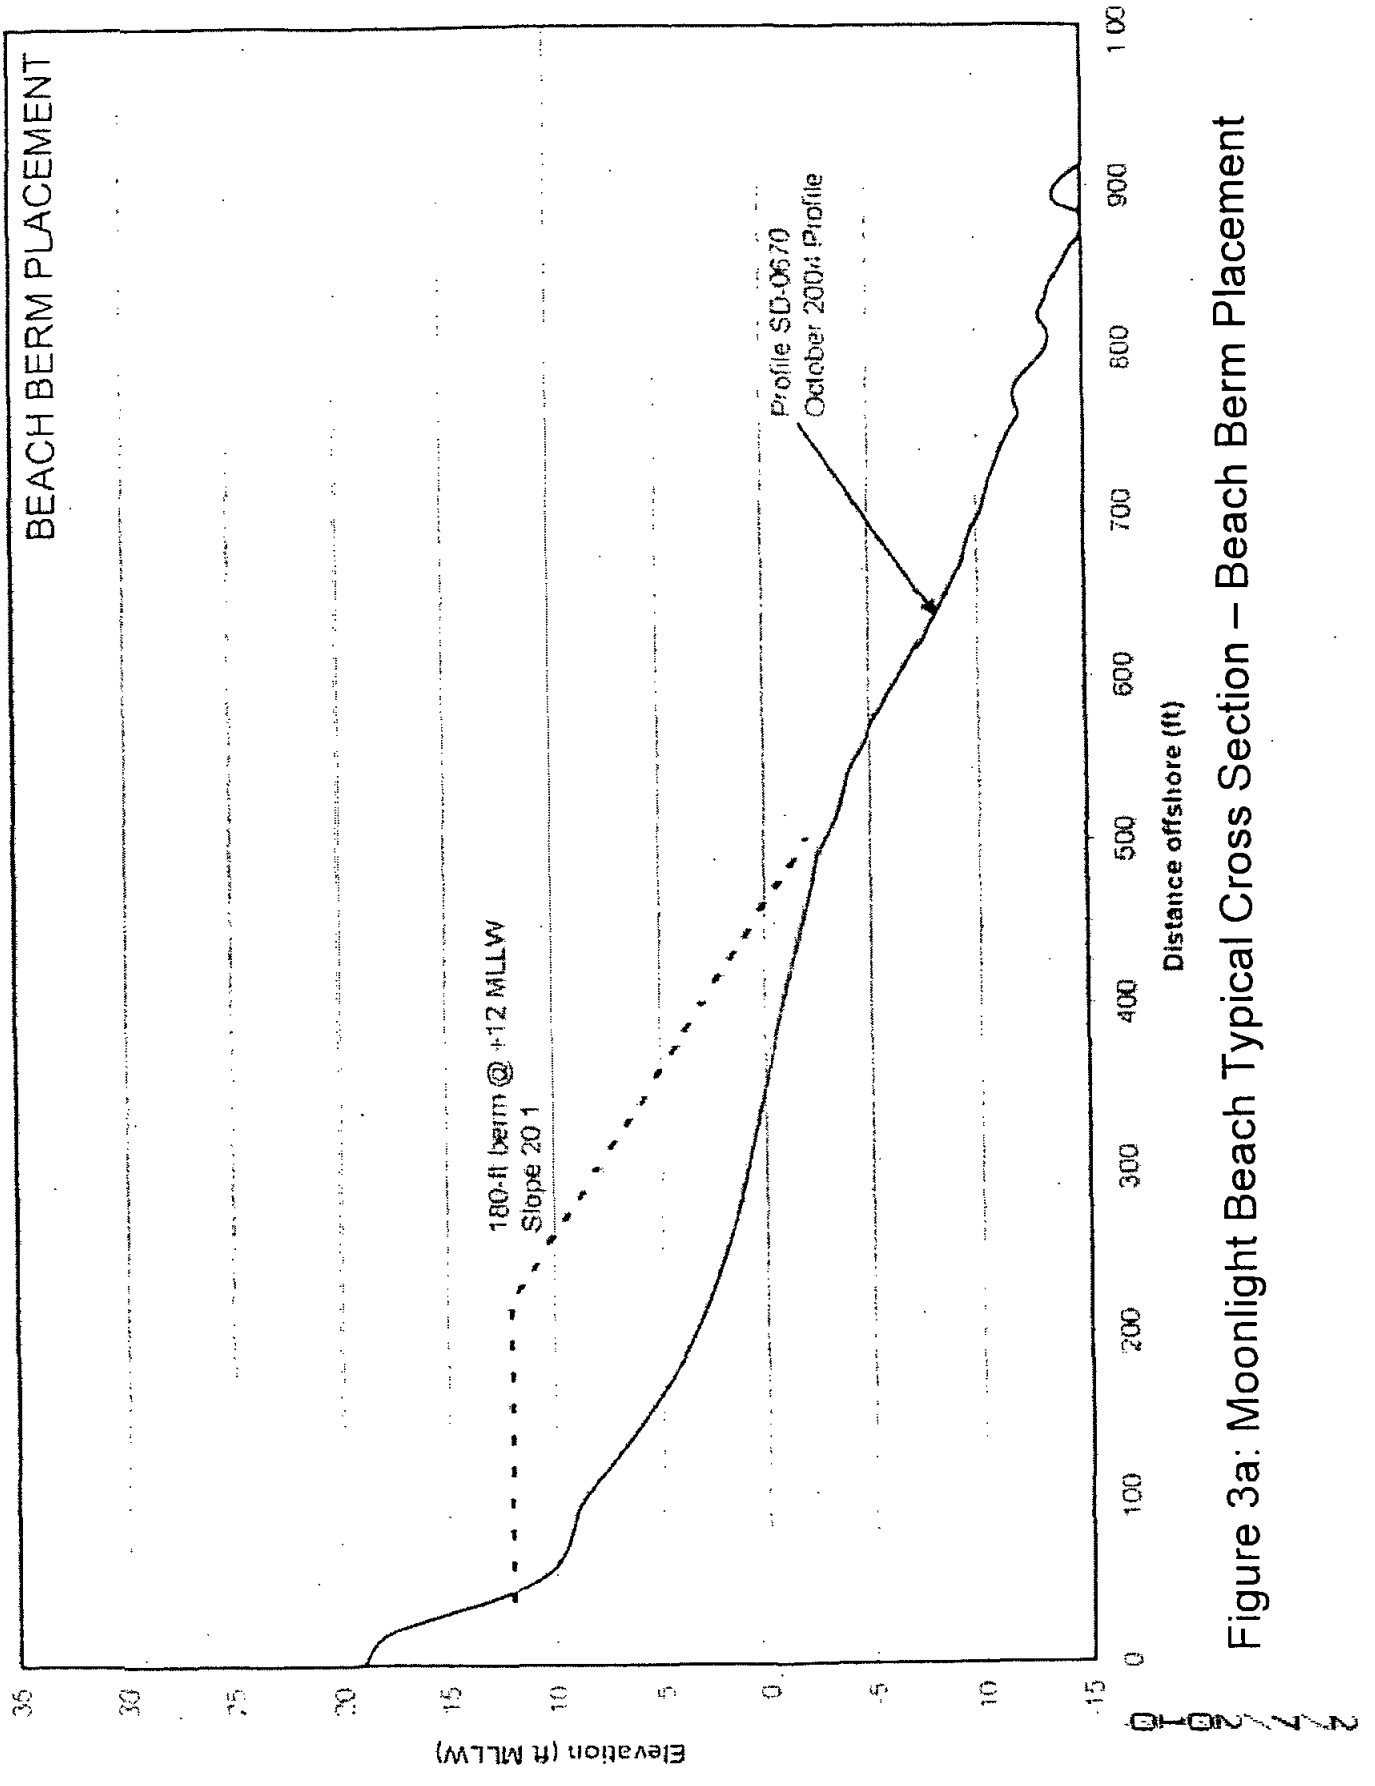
Moonlight Beach Typical Cross Section – Beach Berm Placement
